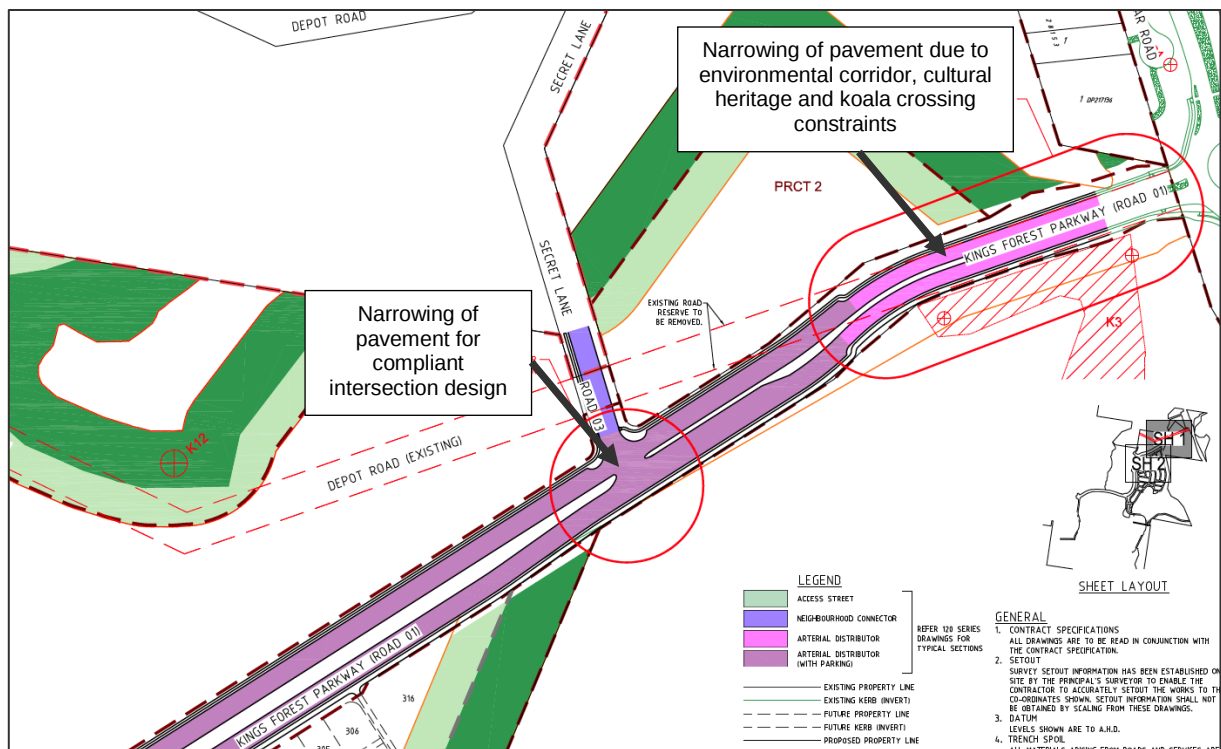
| Extract from proposed plans indicating location of reduced pavement widths
